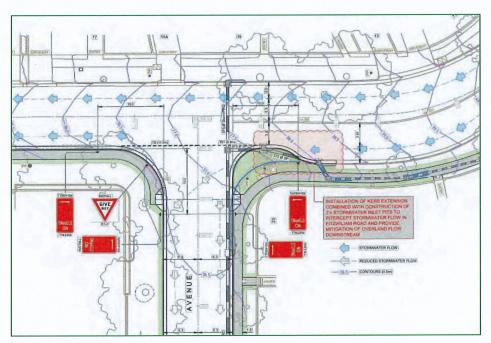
Fitzwilliam Road / Burrabirra Avenue Proposed Intersection Layout
